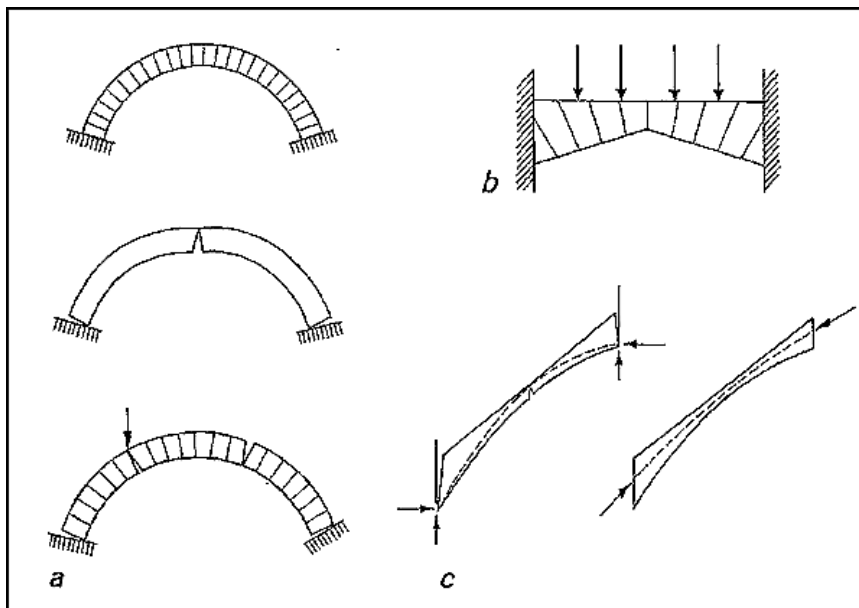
Masonry arches: (a) (from top to bottom): fitting perfectly between abutments; cracking to accommodate an increased span; at collapse by the formation of four 'hinges'; (b) flat arch; (c) flying buttress: (left) passive state; (right) working state
